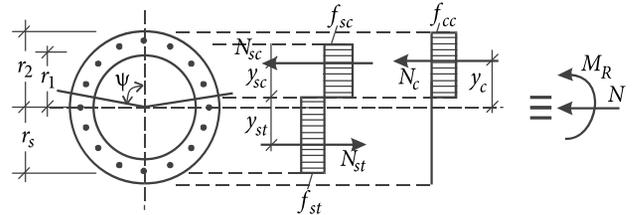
The modelling of stress distribution in the reinforcement and concrete of bracing piers
